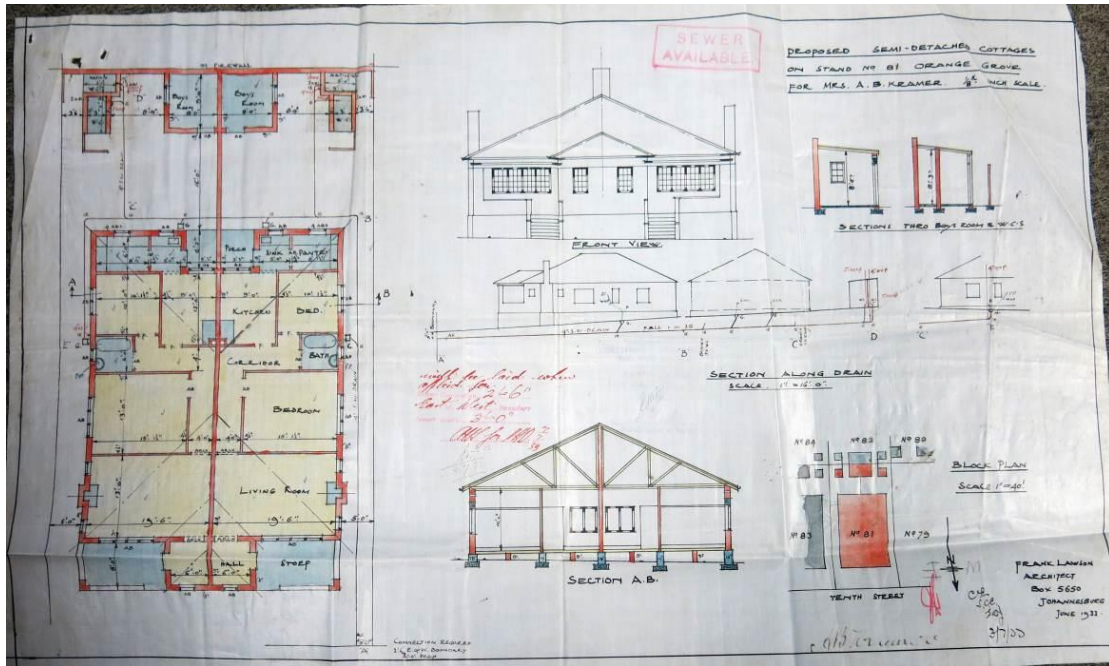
Plan for proposed semi-detached cottages, Stand 81
